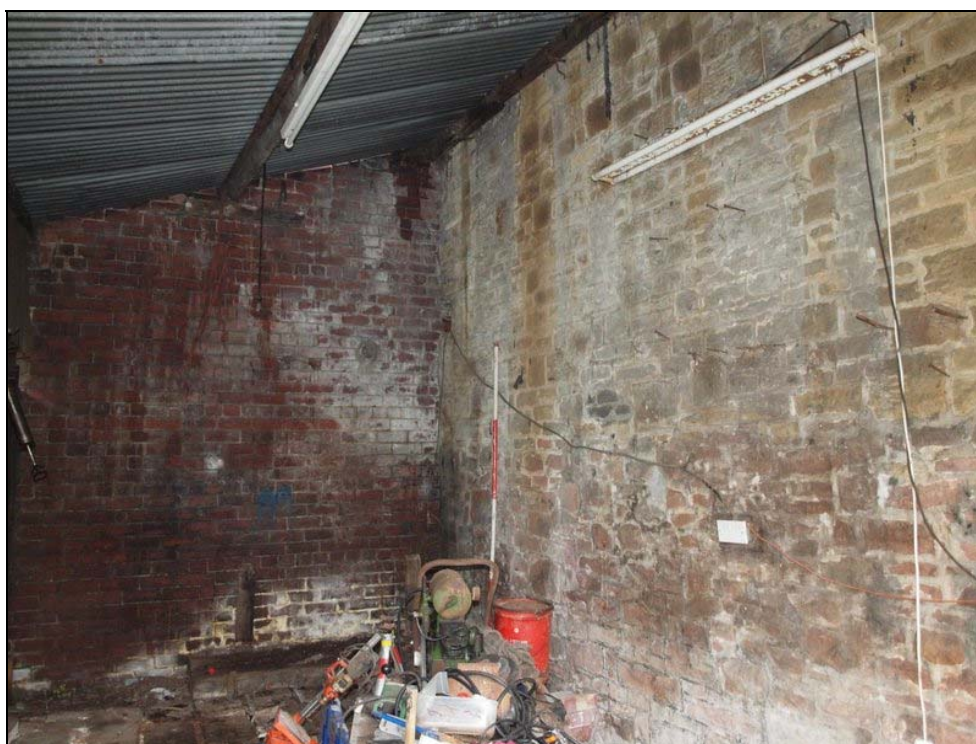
Interior of timber garage, showing yellow sandstone over the red sandstone rubble butting the brick wall.
